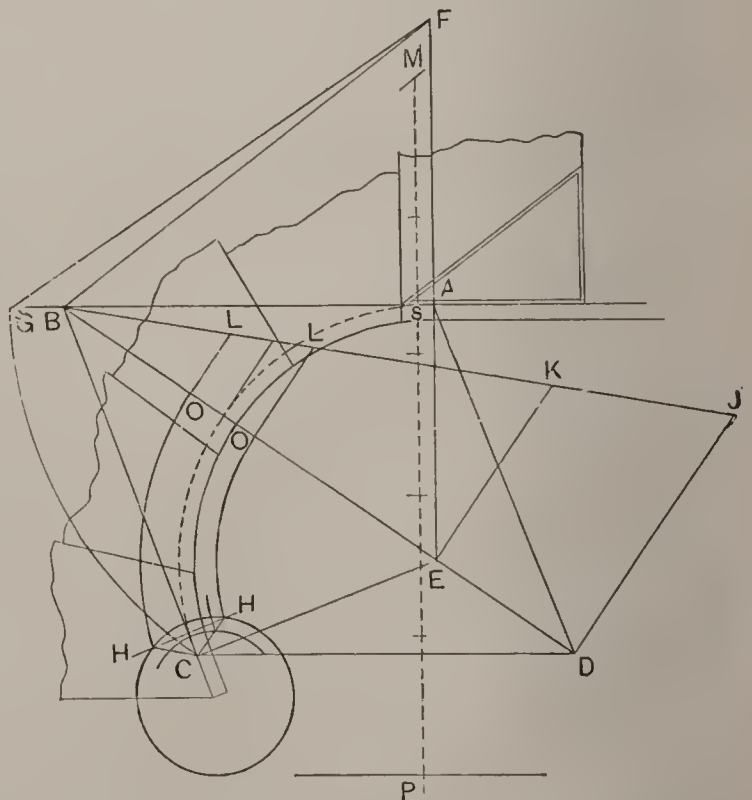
GROUND PLAN, STARTING WITH WINDERS.
